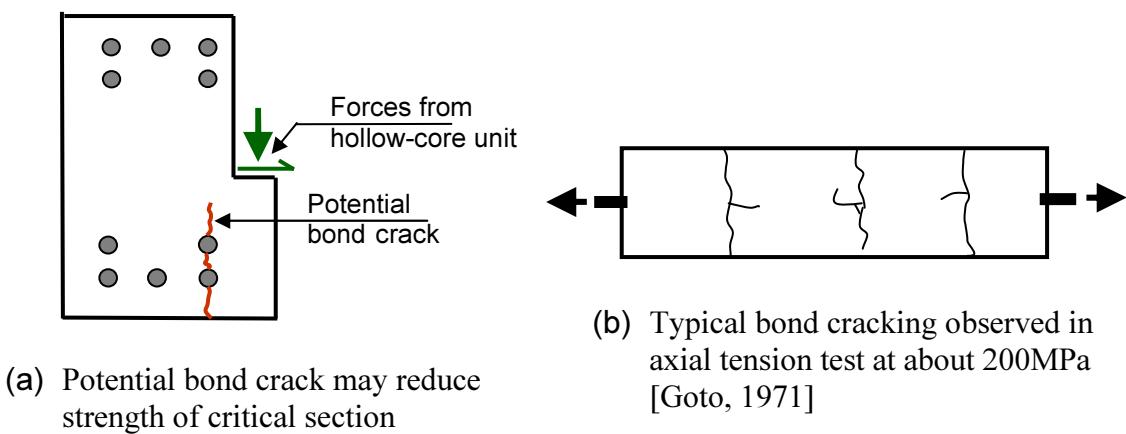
Bond stresses and bond cracks in reinforced concrete
